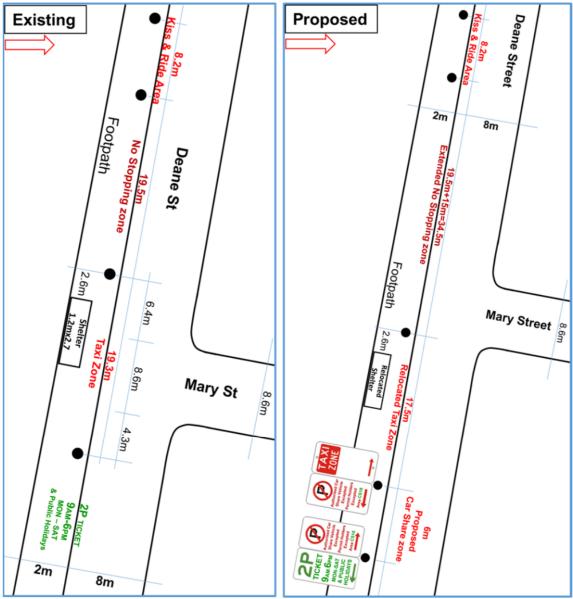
Proposed 6m 'No Parking - Authorised Car Share Vehicles Excepted' (Permit Holders Excepted Area CS13) zone in Deane Street.
